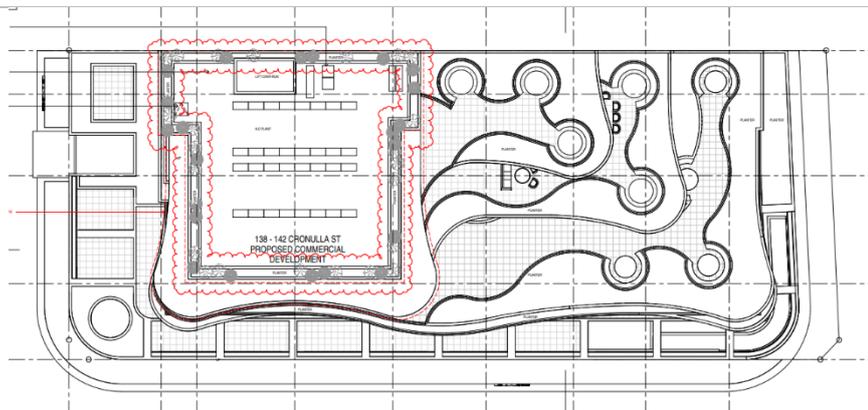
Location of the lift overrun and plant in relation to the roof plate and also the site boundaries. (Source: Innovate Architects)
